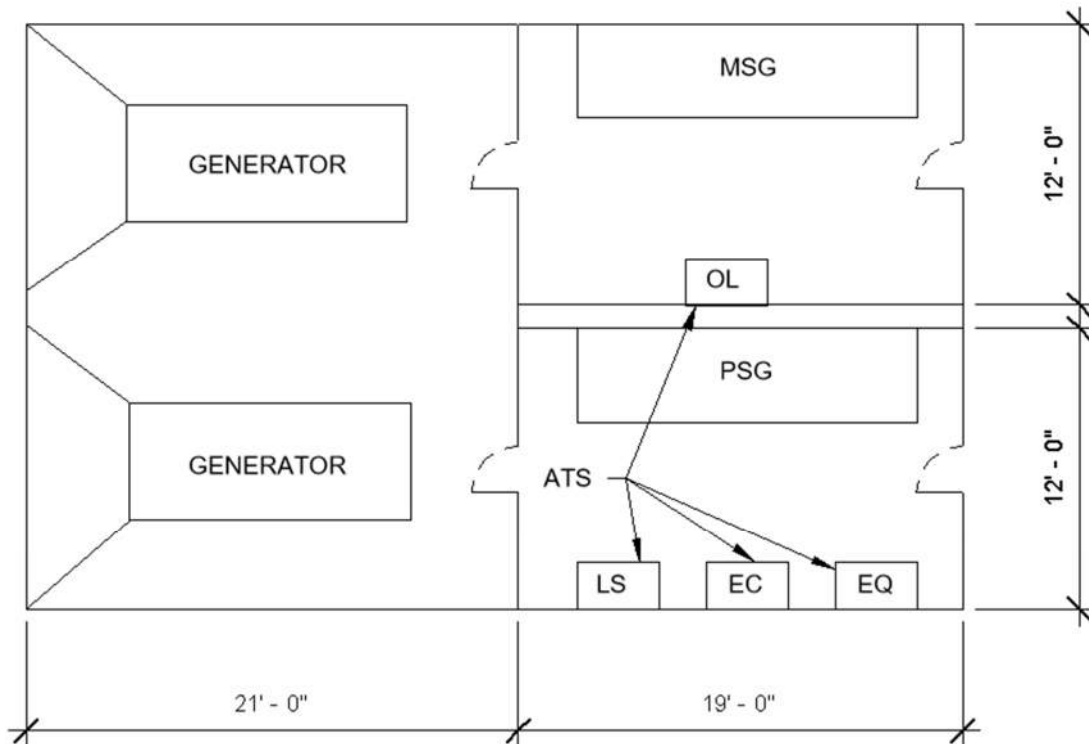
Proposed layout of new powerhouse for the Main Hospital.
